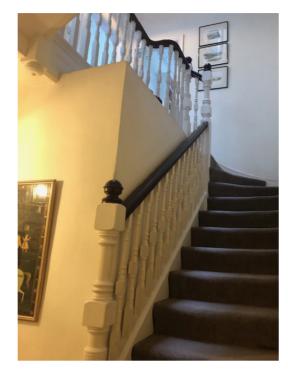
Stairway to the 3rd floor; The stair balustrade and handrail are proposed to be retained and refurbished generally.
